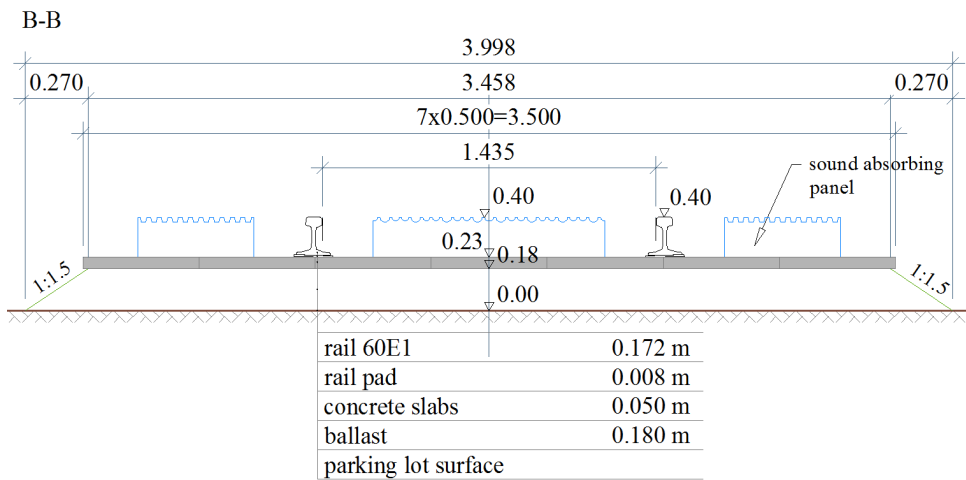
Cross-section of the ballastless track structure with sound absorbing panels.
